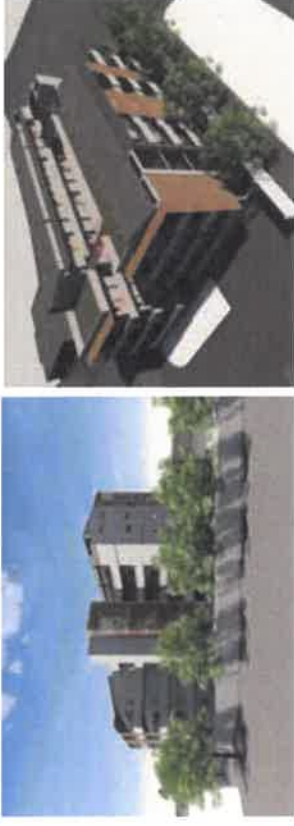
View of Building from R44 (Left); and Aerial View showing Communal Roof-top Braai area (right)
